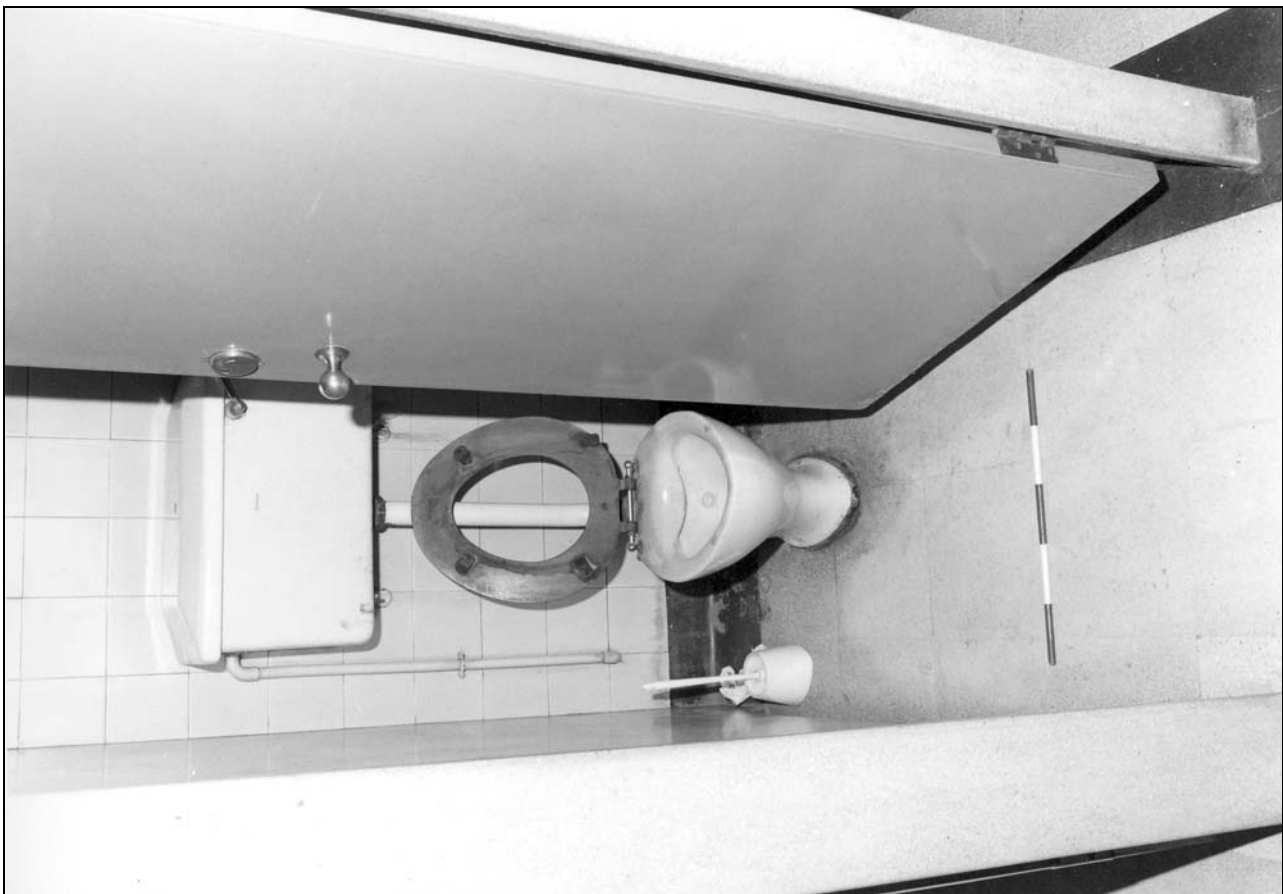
Detail of WC in "works lavs" (film 5, frame 10)
